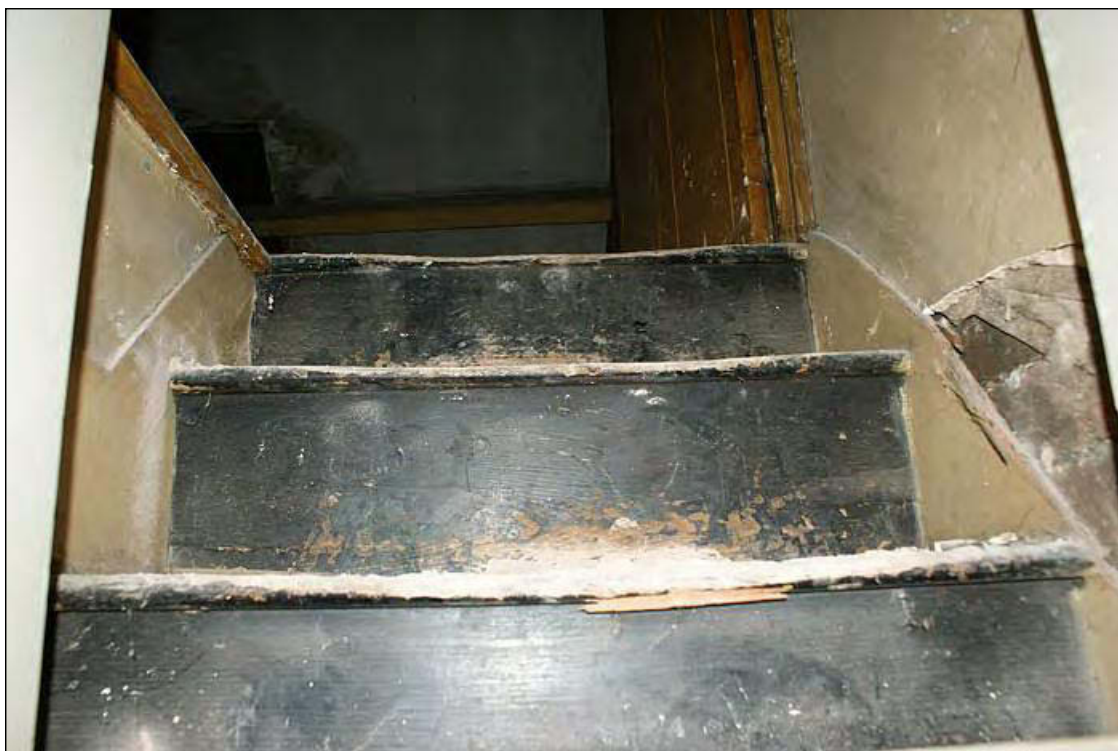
Remains of staircase leading to attic space of 42 Southgate Street
